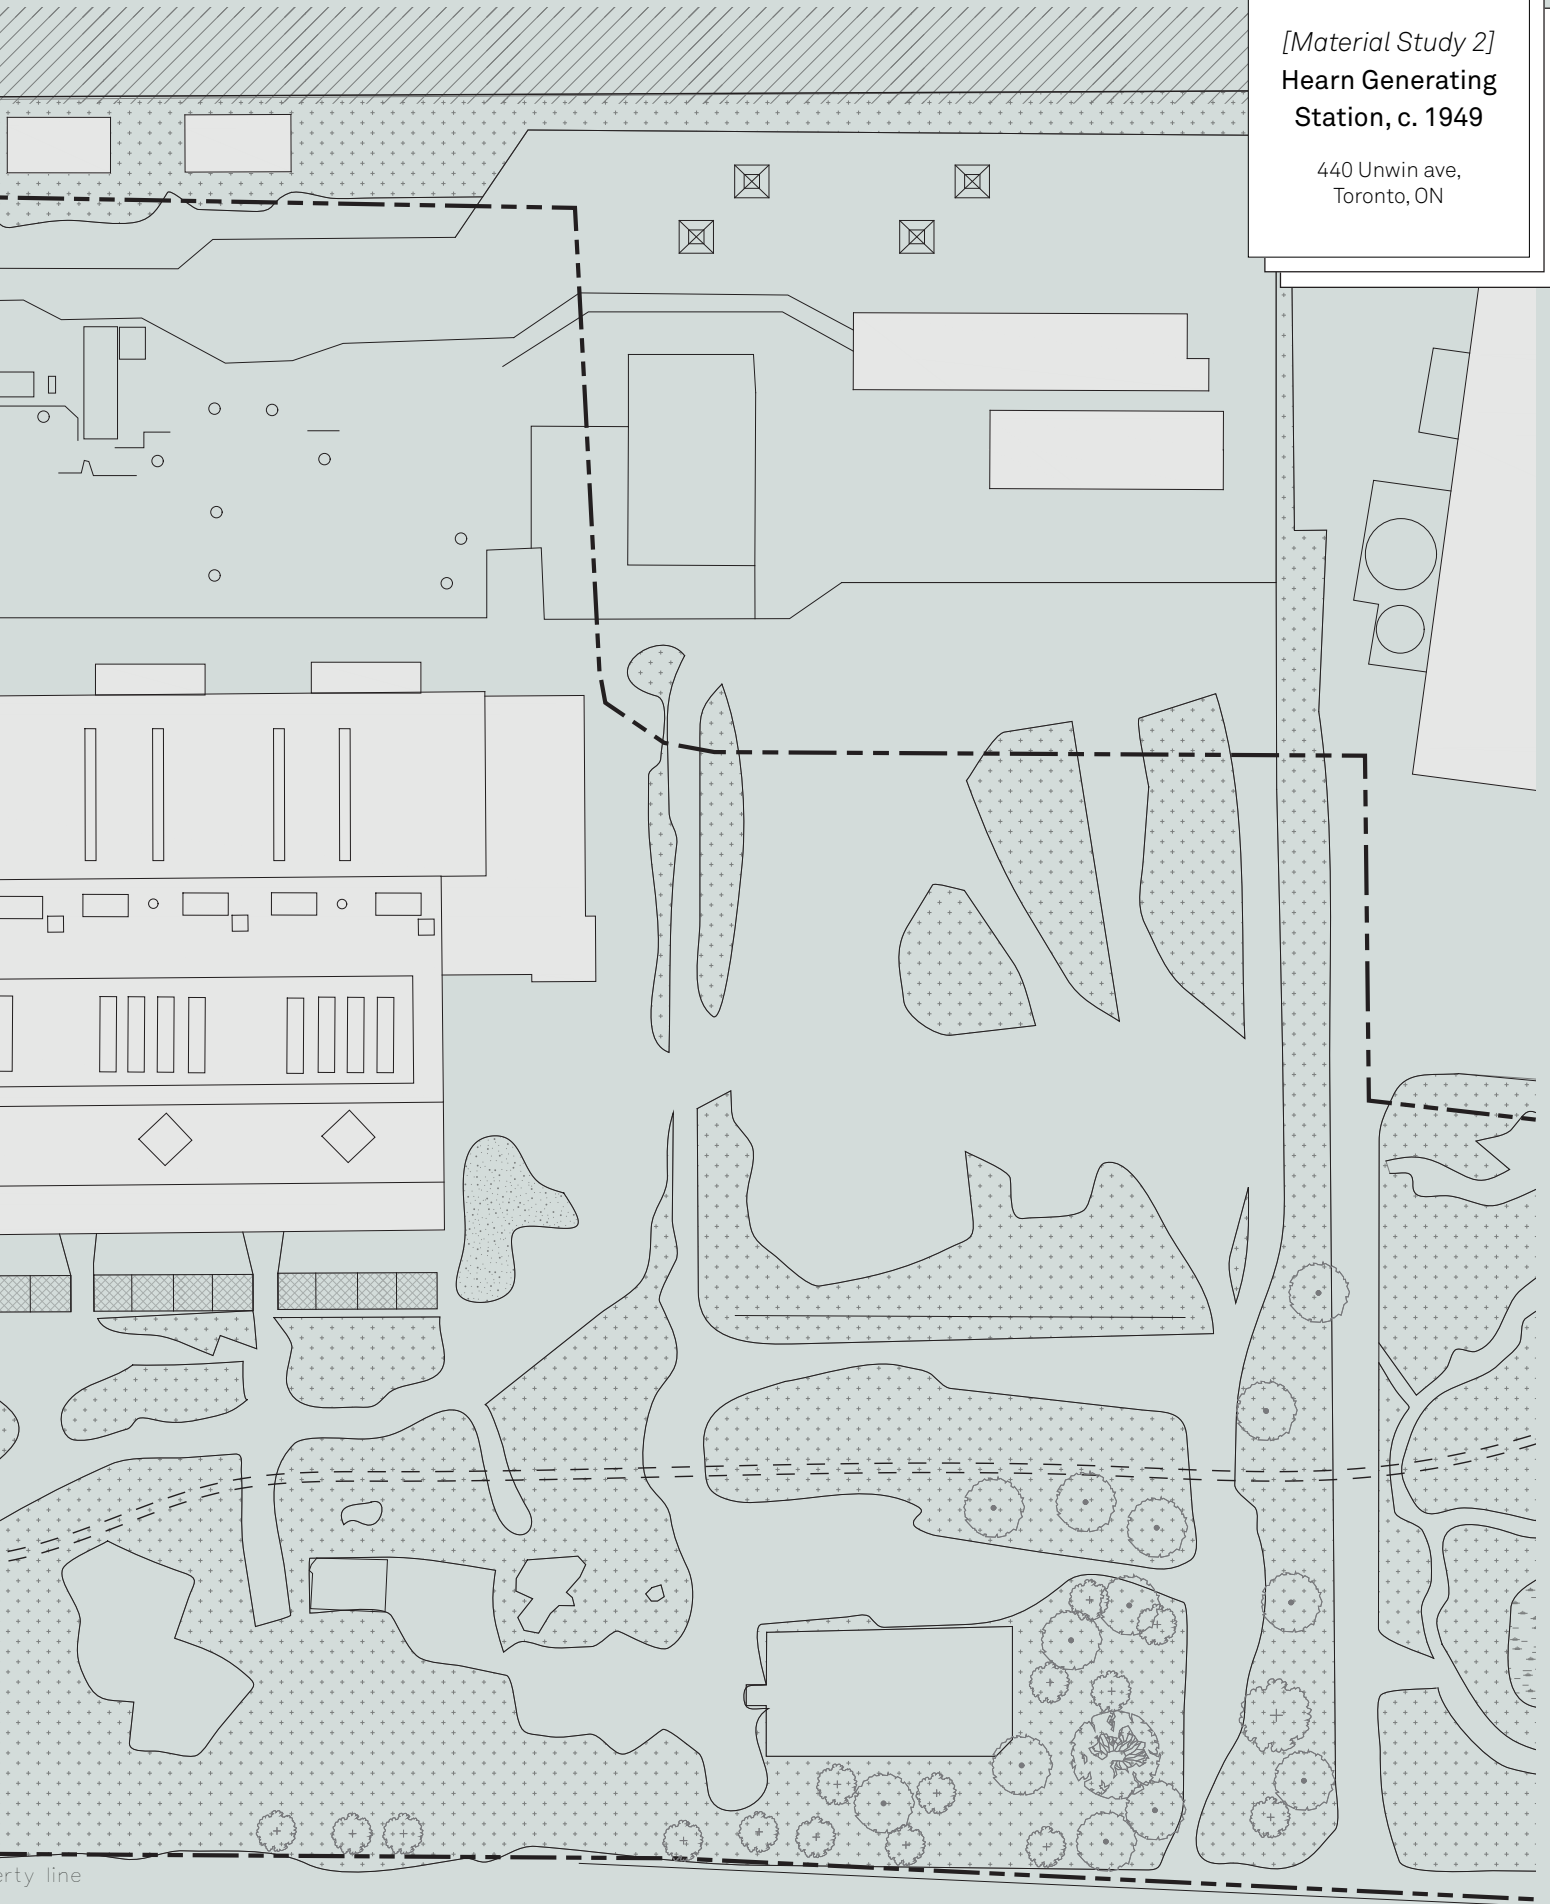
Site plan of the Hearn Generating Station and surrounding context.
